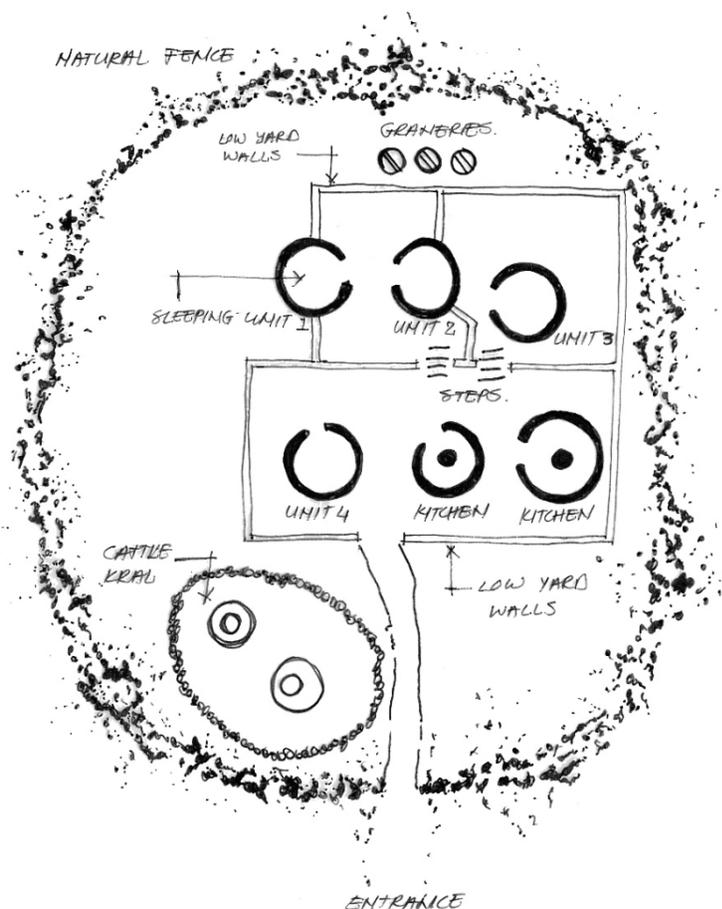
'Kraal' plan layout
